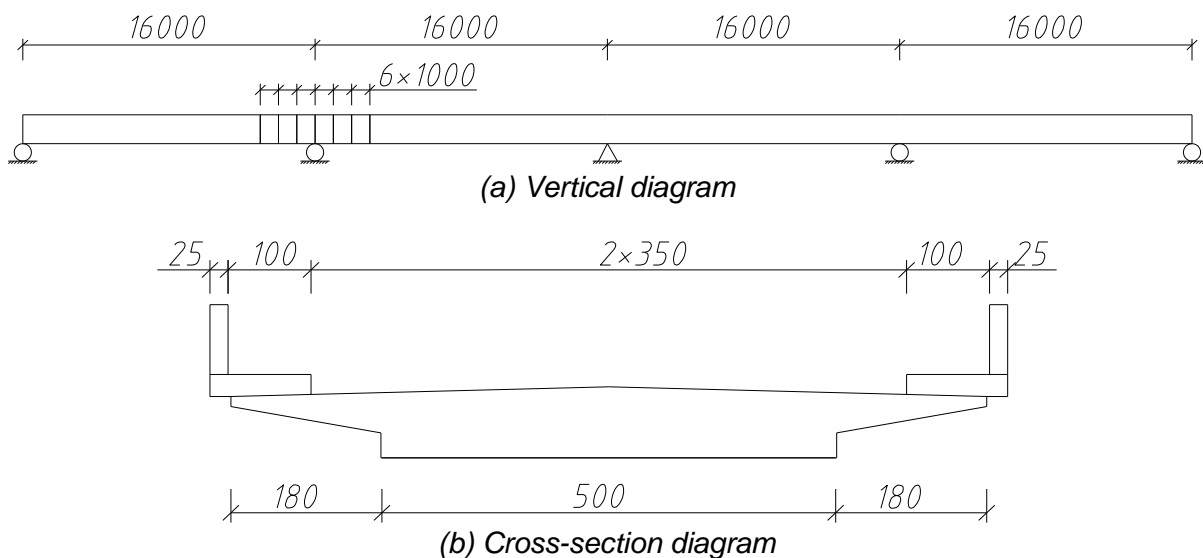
The vertical and cross-section diagrams of the studied bridge (unit: mm)
